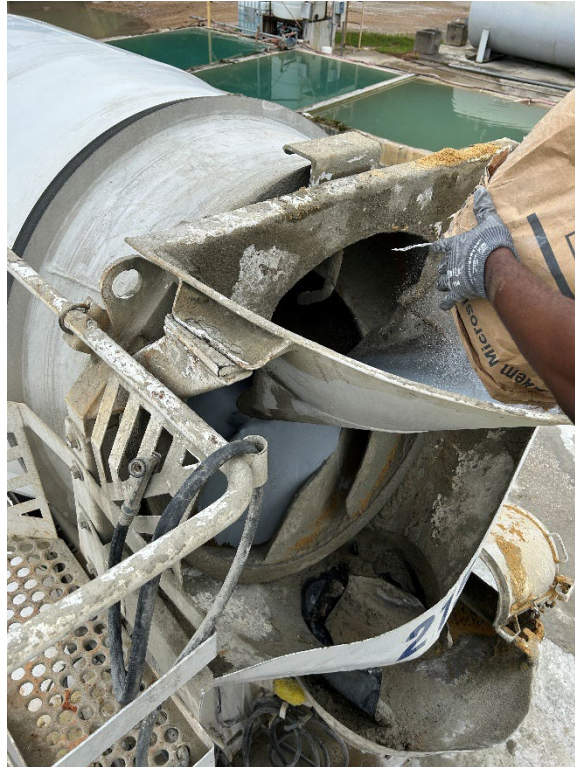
HRC Personnel Adding Silica Fume to the Ready Mixed Concrete Truck at the Plant
